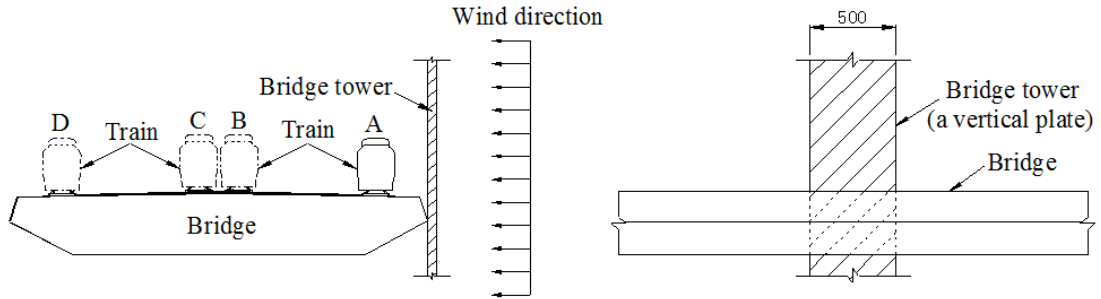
Rail track position and bridge tower model (Units: mm) (Li *et al.* 2013)
